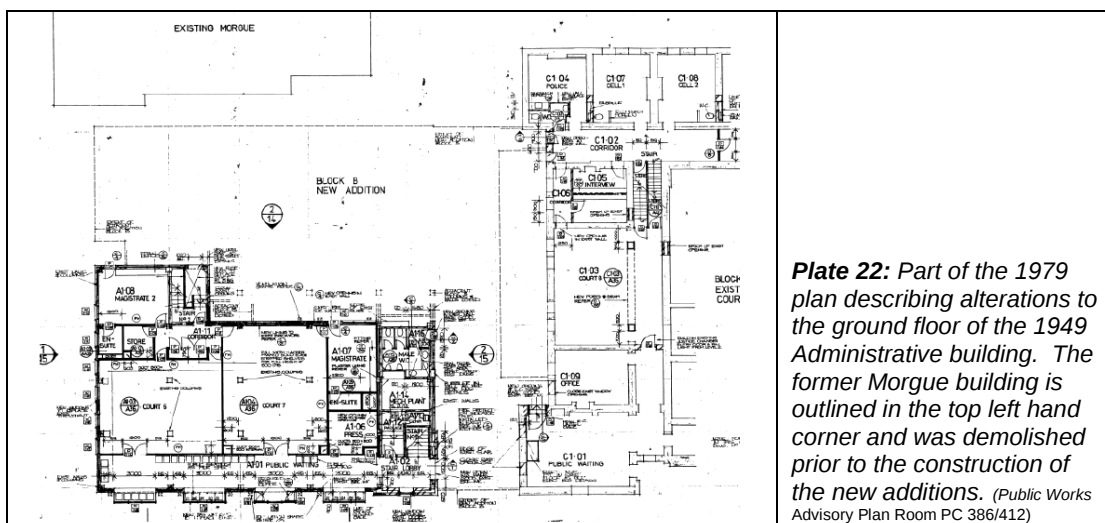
Part of the 1979 plan describing alterations to the ground floor of the 1949 Administrative building. The former Morgue building is outlined in the top left hand corner and was demolished prior to the construction of the new additions. (Public Works Advisory Plan Room PC 386/412)
